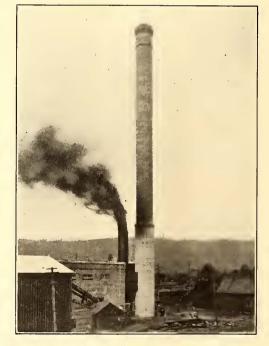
COMPLETED CONCRETE CHIMNEY
